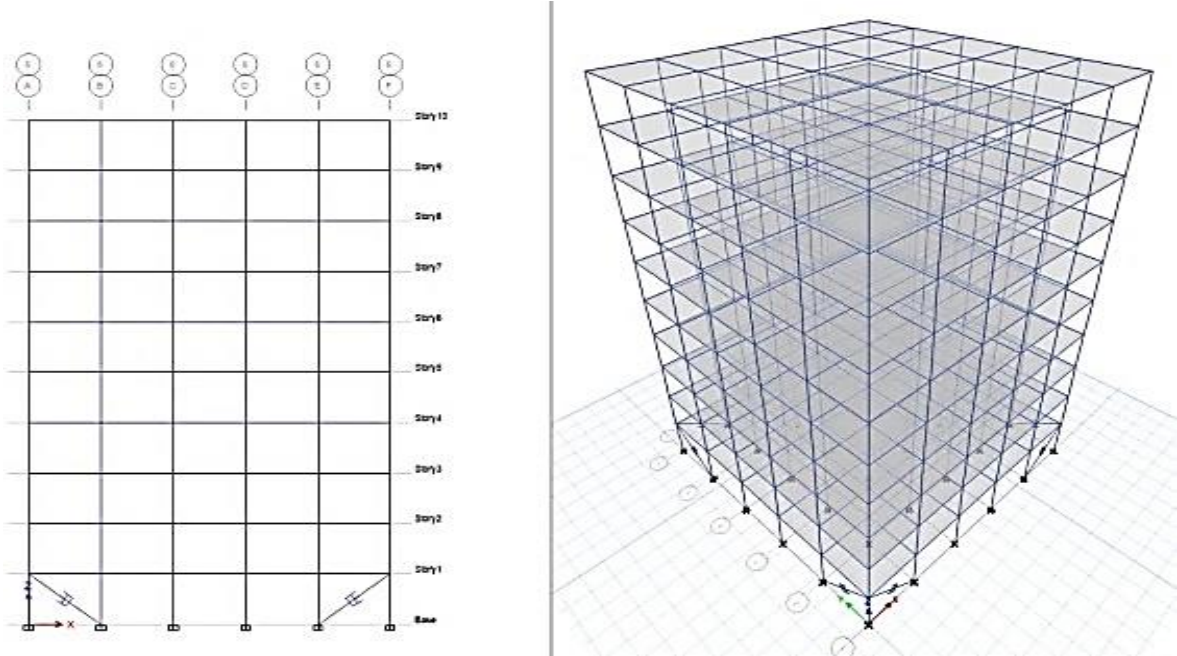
RC bare frame, dampers at corner, only in ground storey (BDCG)
